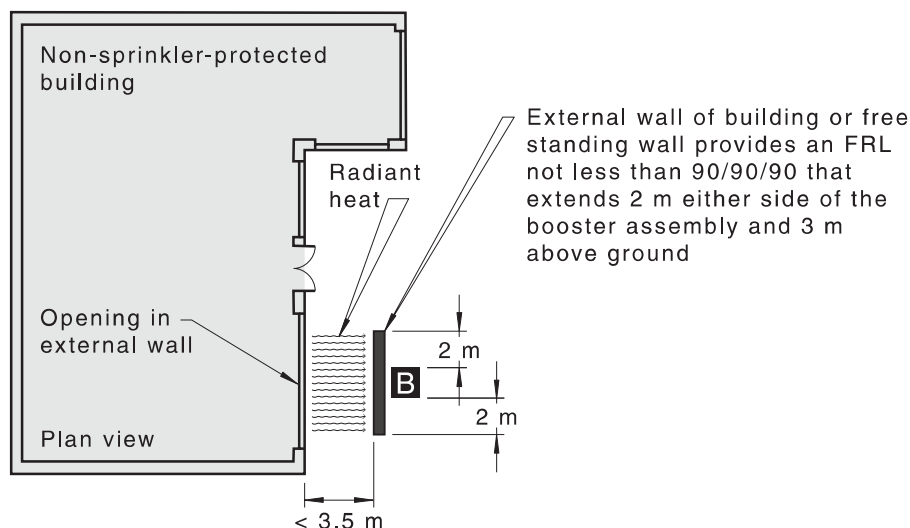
(B) — Fire brigade booster assembly provided protection by a free-standing wall located less than 3.5 m from the external wall of the building
